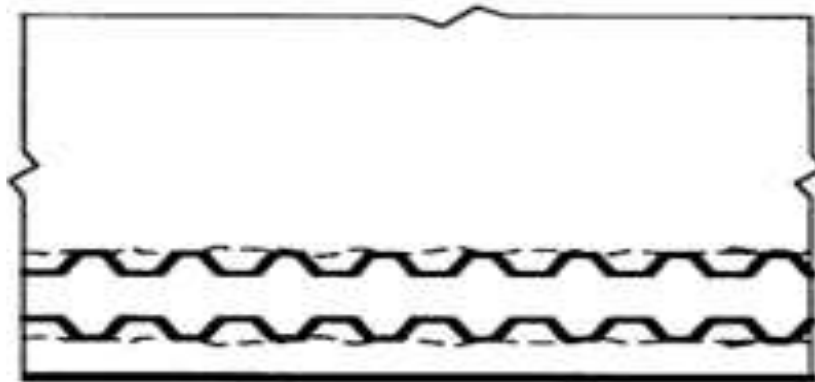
Crushing of concrete that surrounds reinforcement bar [15].
